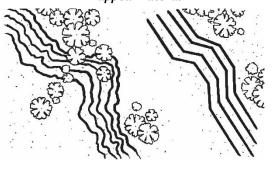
Terrace retaining walls to reduce cut and fill and minimize height
